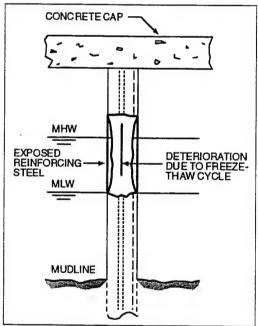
Loss of concrete cross section due to freeze/thaw cycle.
